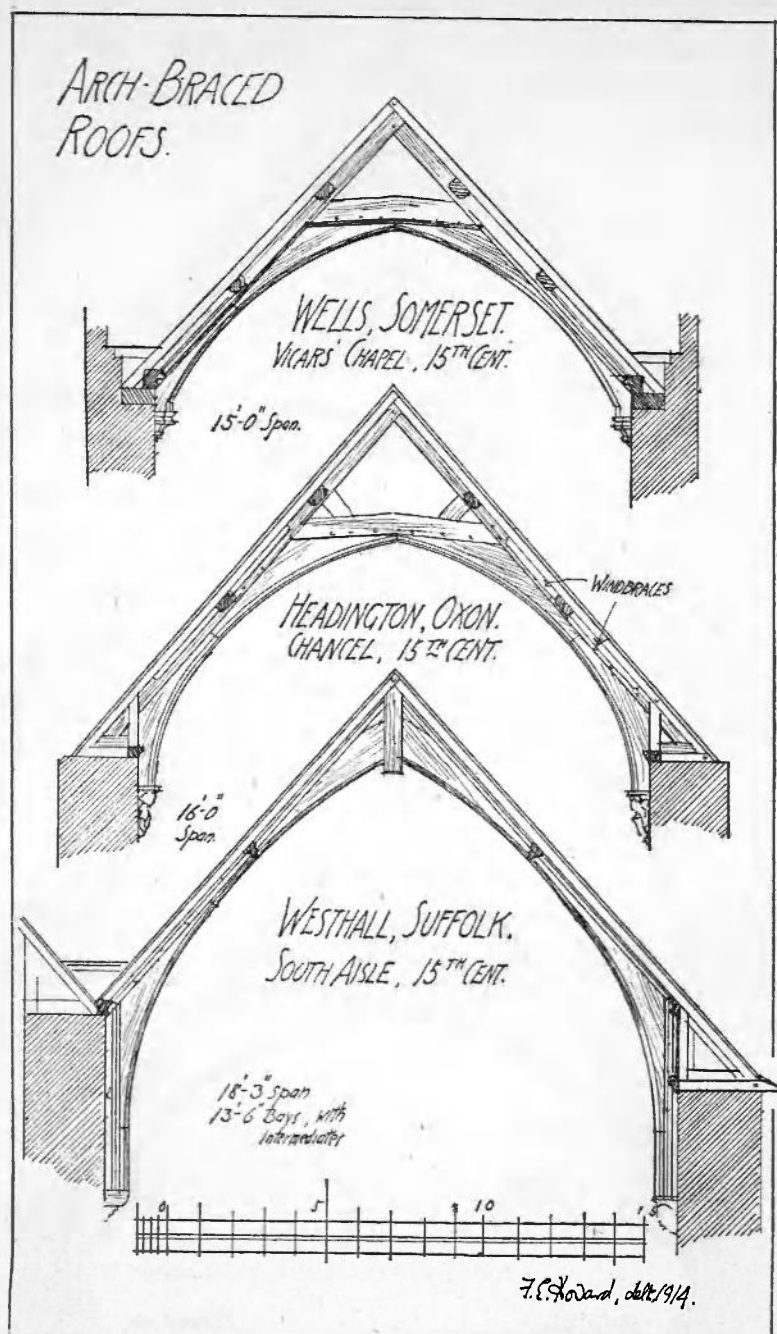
ARCH-BRACED ROOFS, SHOWING DEVELOPMENT OF THE WALL-POST.
